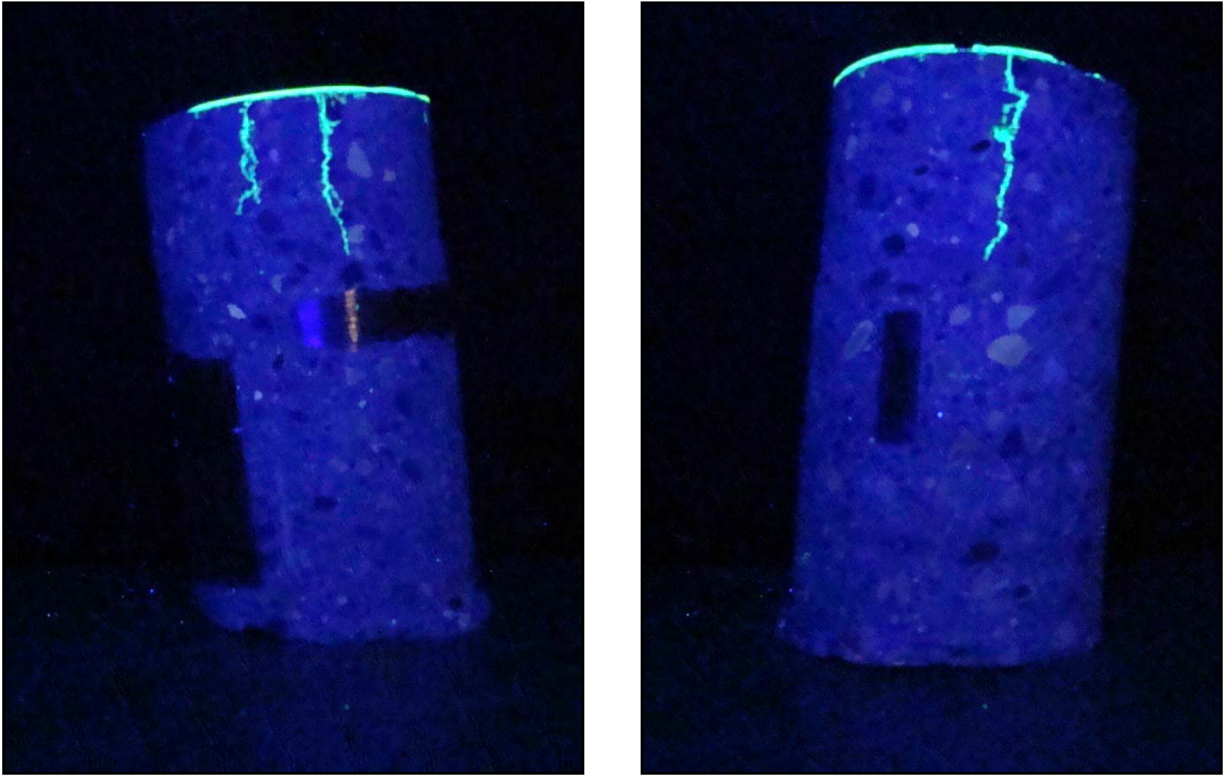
Core LS3 (left) north-northeast elevation; (right) southwest elevation
